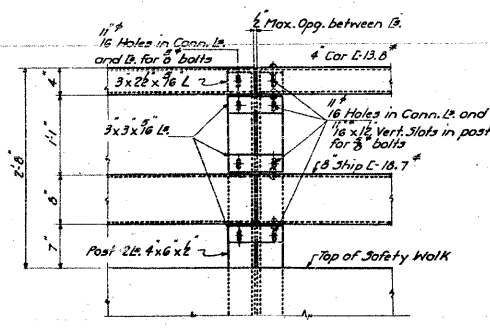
DETAIL A CONNECTION AT INTERMEDIATE DIAPHRAGMS
